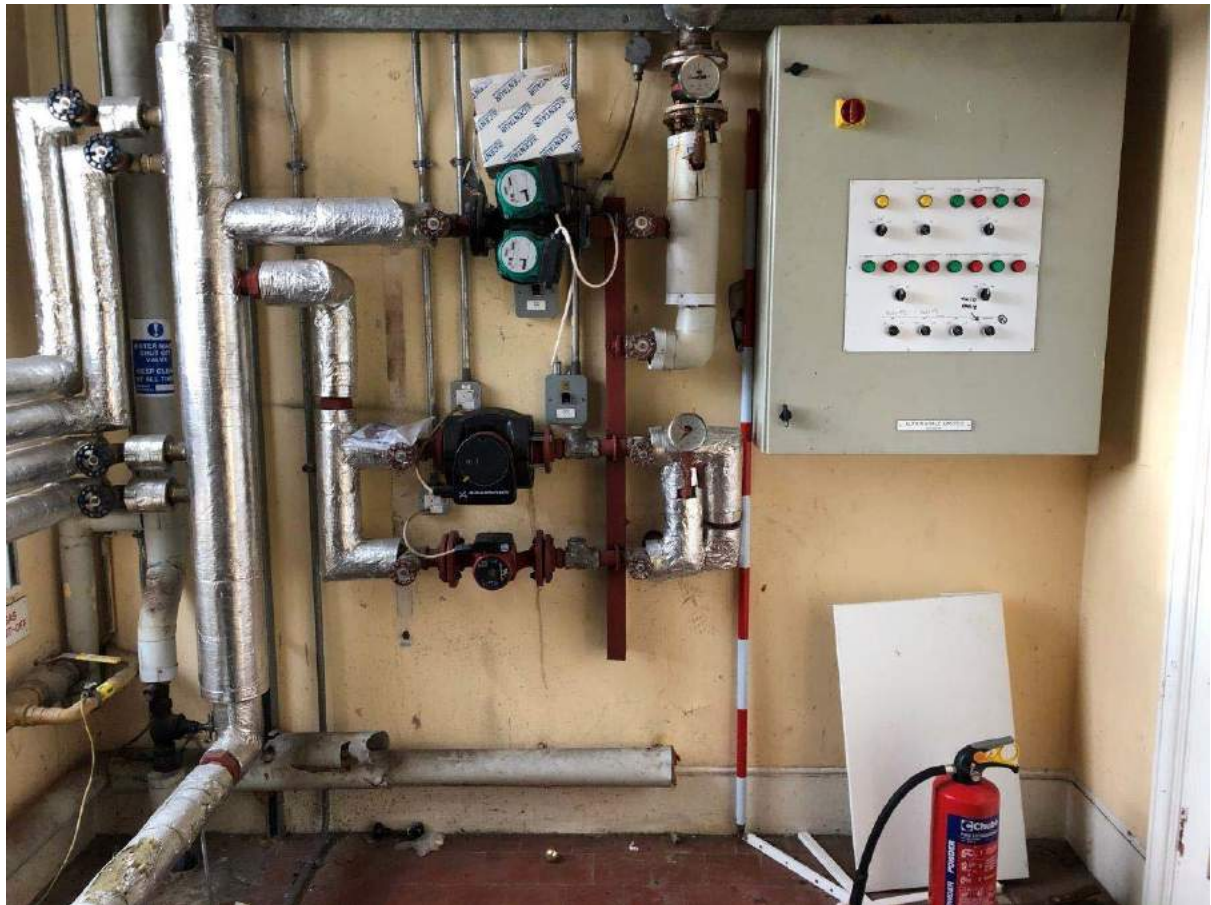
Existing Plant Room. The wall and skirting board behind the control panel and pipe-work would be removed to create a larger utility space. Scale = 2m.
